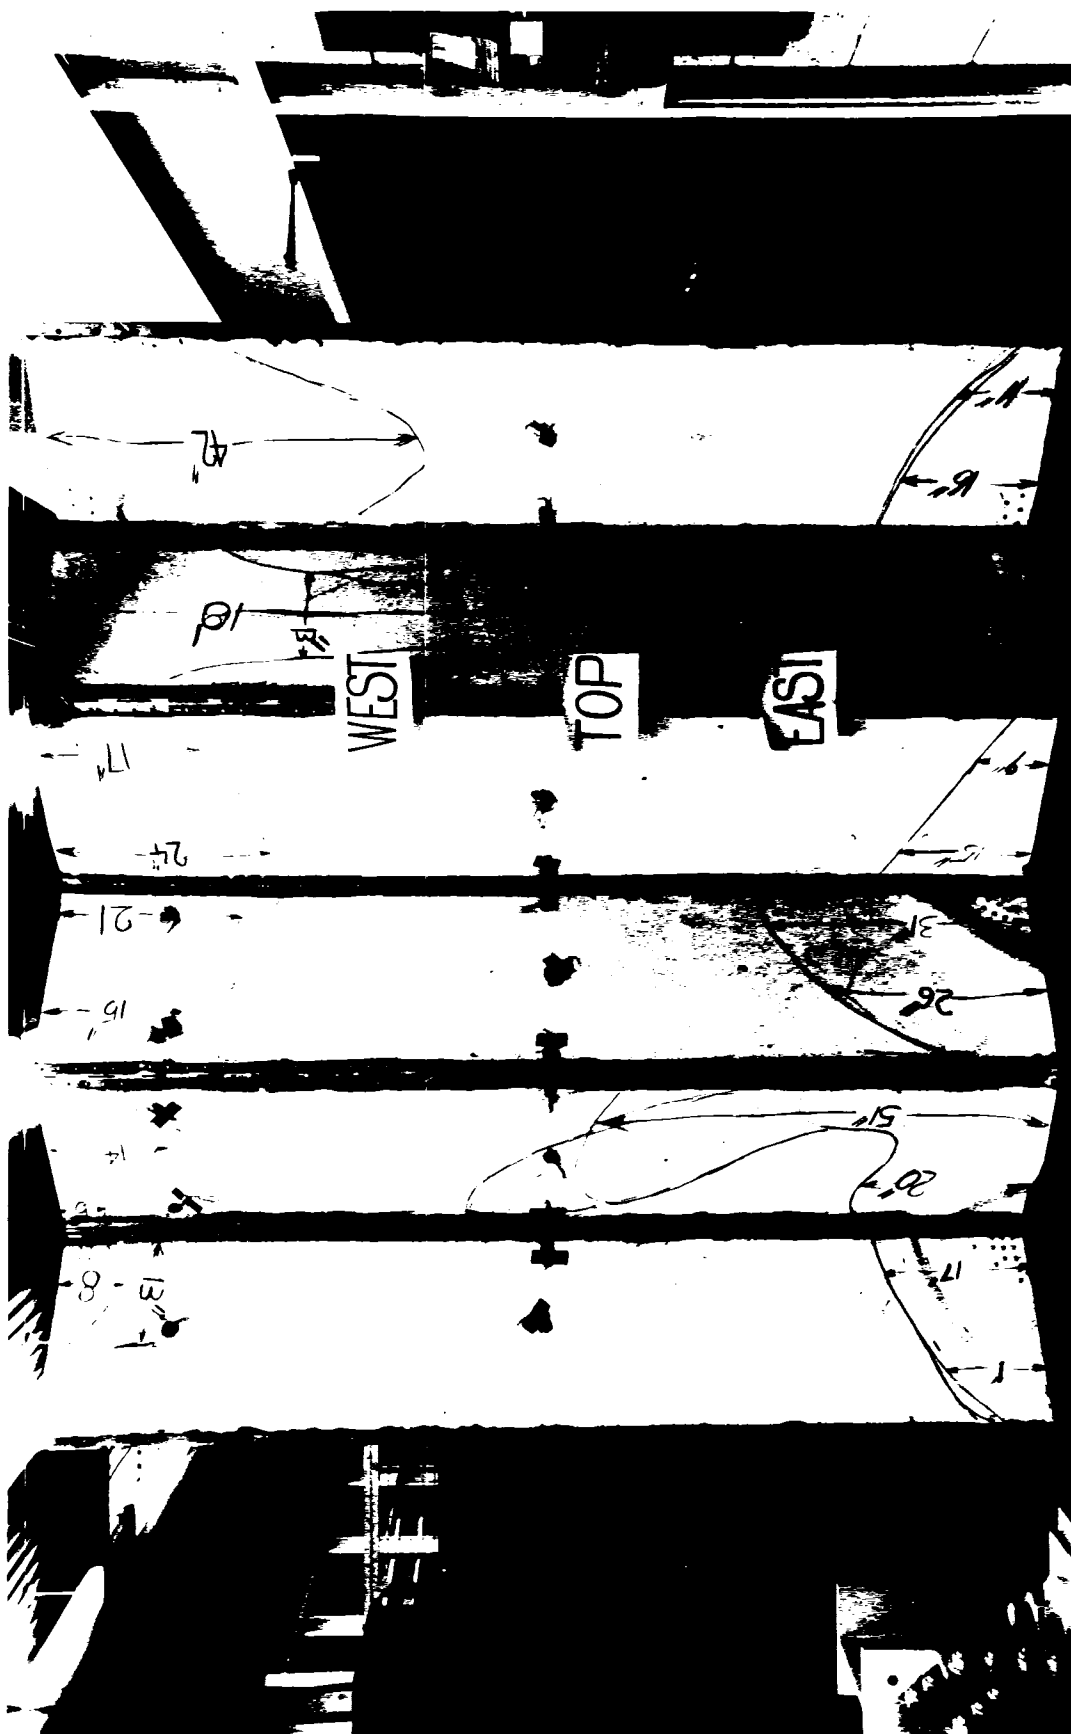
TOP VIEW OF THE 9.5-FOOT MODEL AFTER FAILURE.
